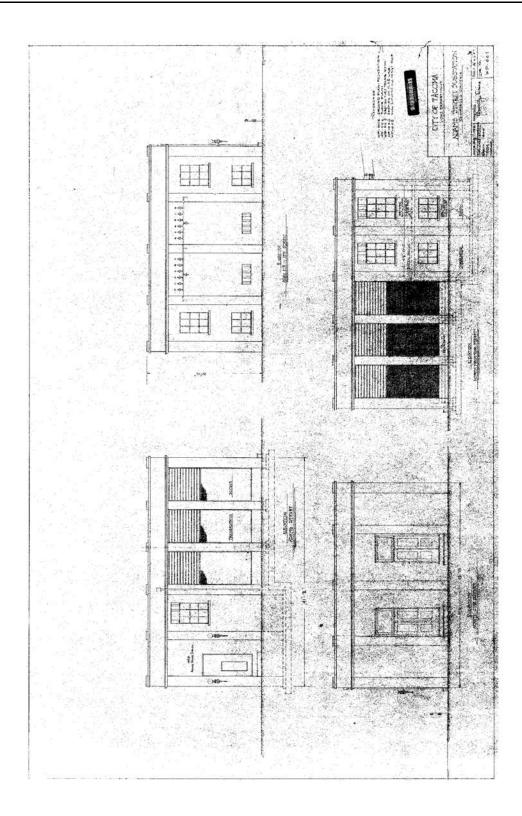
Adams Street Substation Elevations 1924, Drawing courtesy of Tacoma Power
